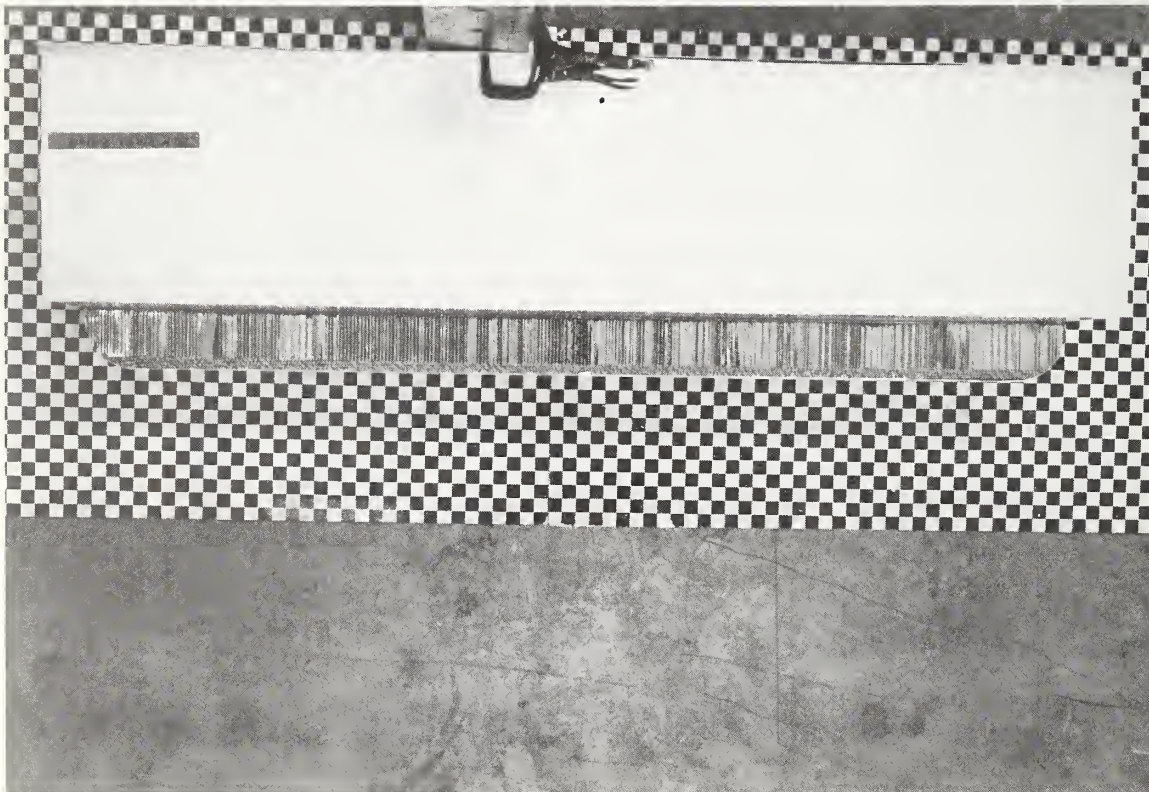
PRE-TEST MDD FACE - VIEW 1
